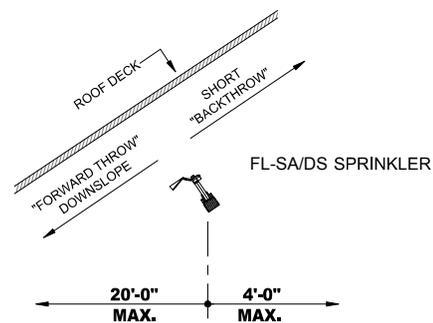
SPRINKLER FRAME ORIENTATION TO ROOF SLOPE
